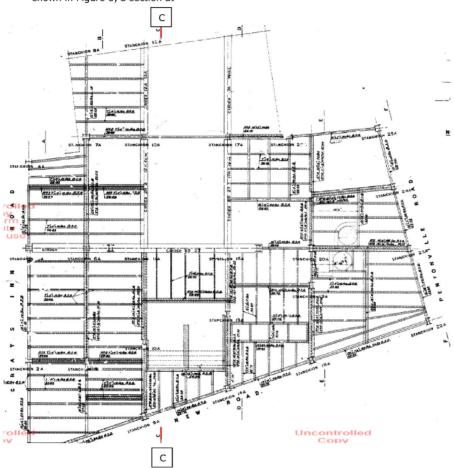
Archive drawing Metropolitan Railway Kings Cross Reconstruction Ground Floor Plan of Girders Joists etc. Contract Drawing No.3.
